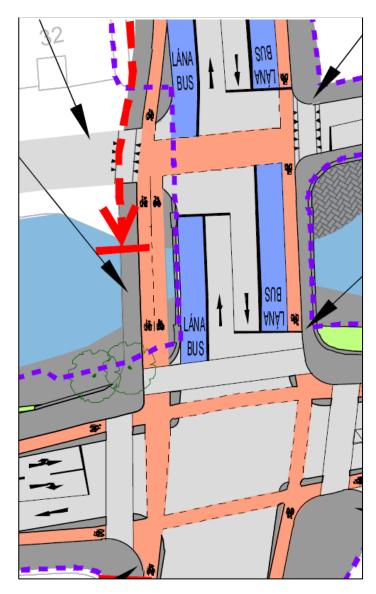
Proposed Widening of Robert Emmett Bridge Option 1
